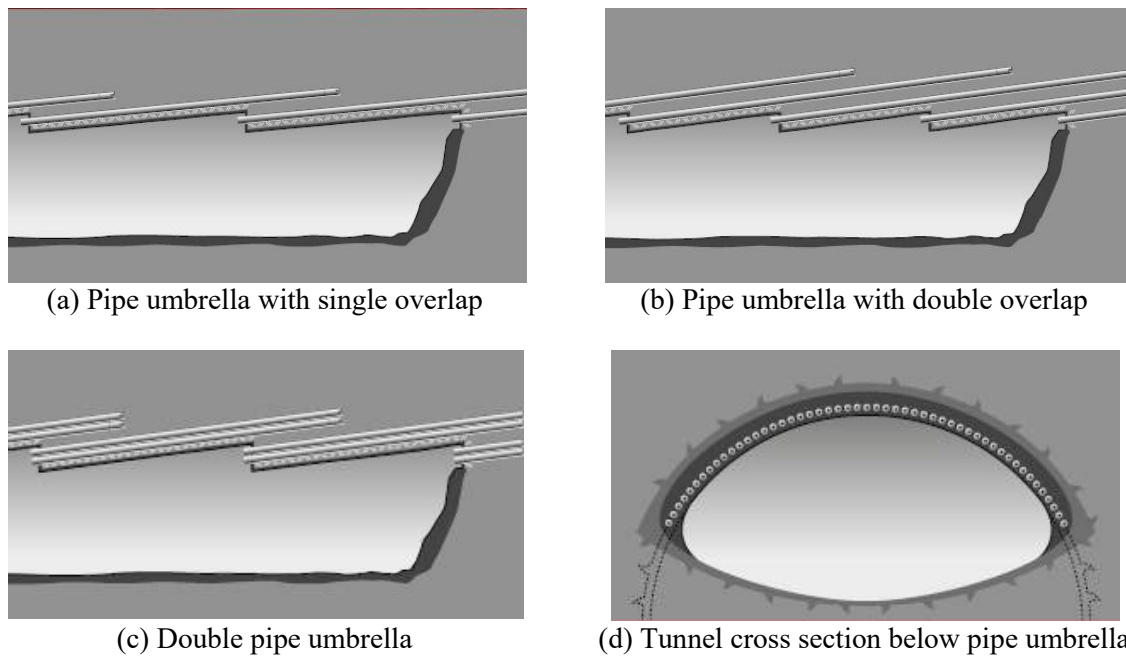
Different configurations of pipe-roof umbrella and excavated tunnel cross section below the pipe-roof umbrella (DSI, 2019)
